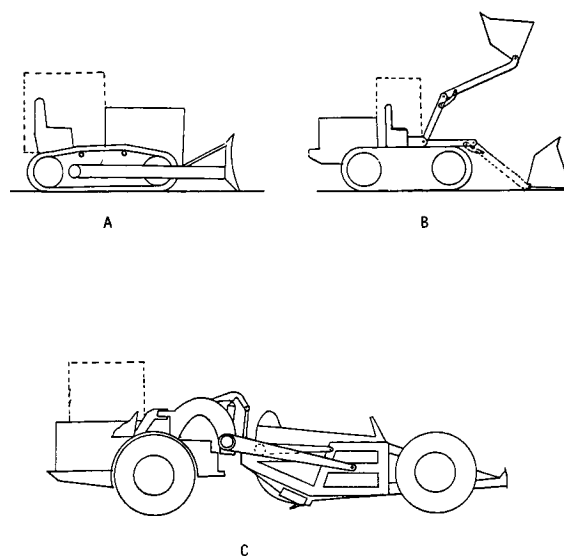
Excavating machines: (a) bulldozer, (b) front end loader, and (c) scraper loader.
